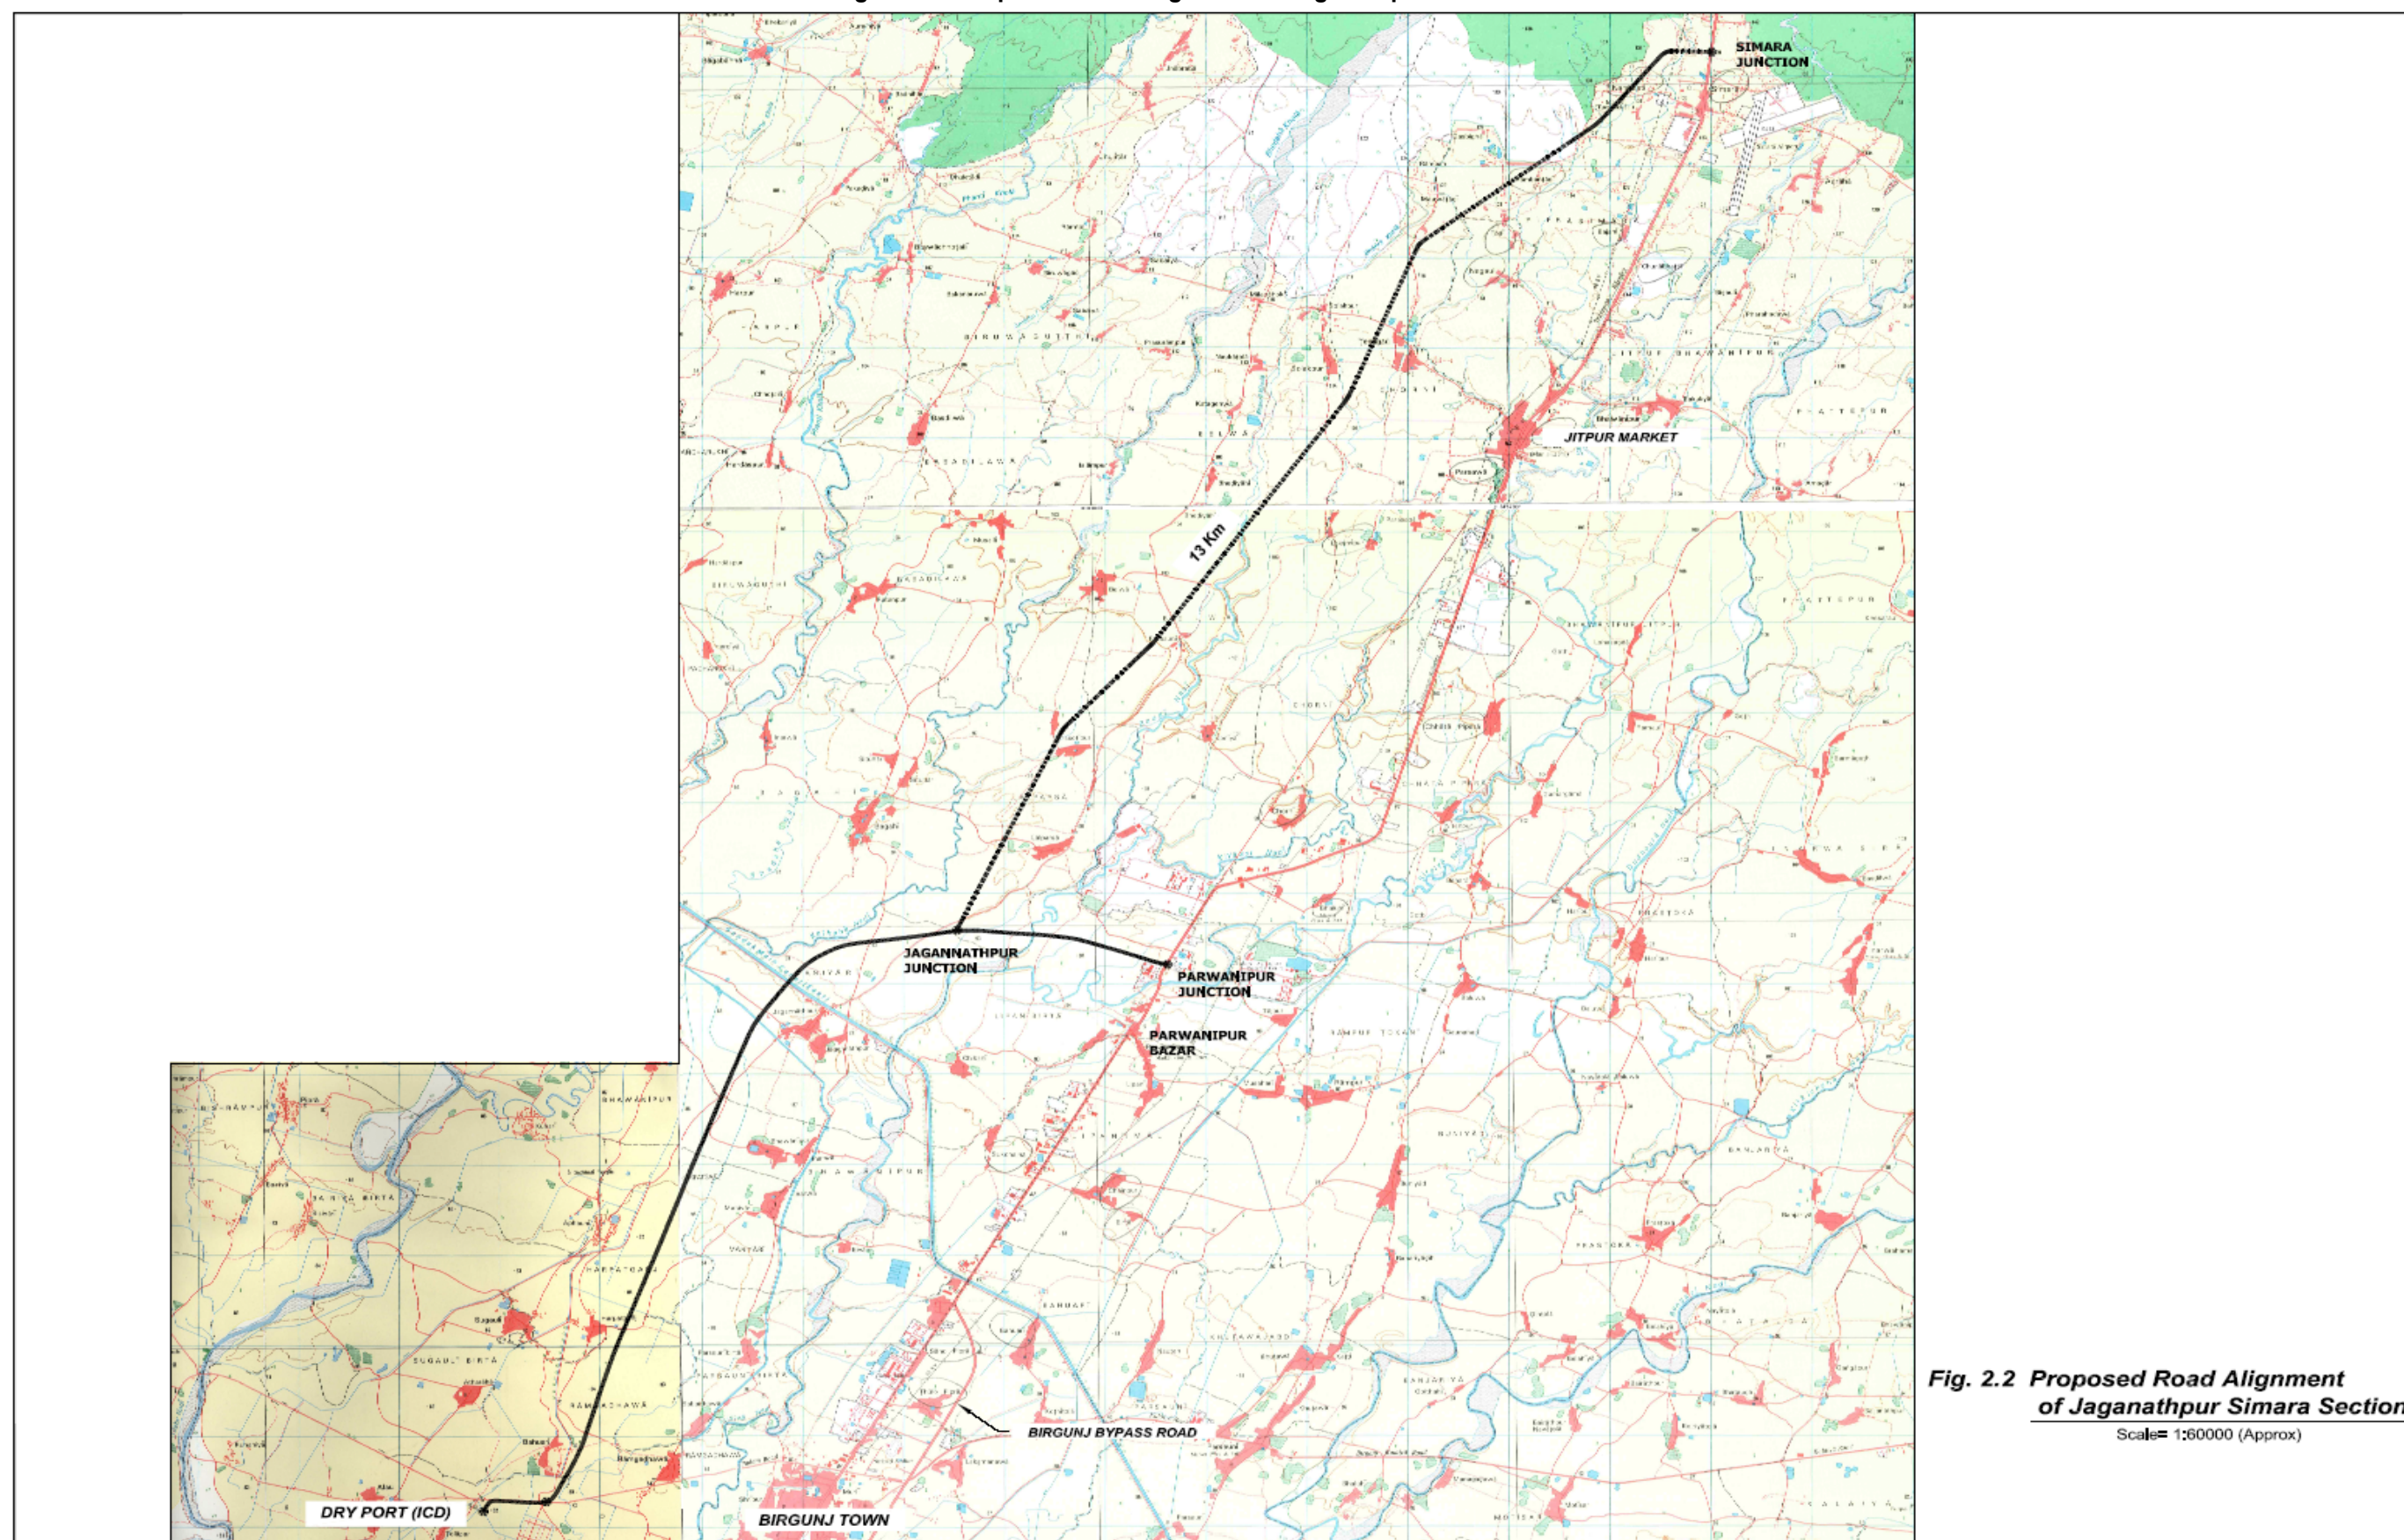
Proposed Road Alignment of Jaganathpur Simara Section
